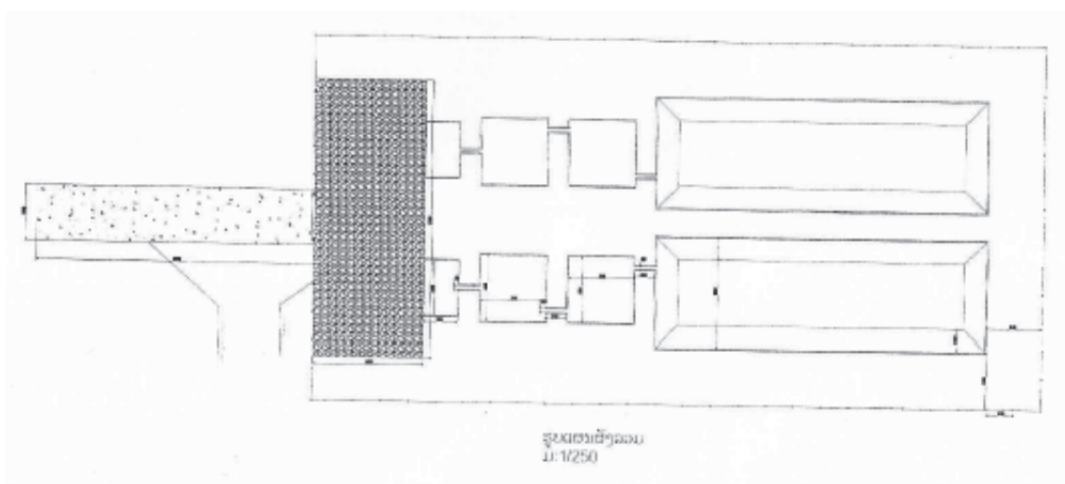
As built drawing of treatment facility for the sludge from septic tanks
